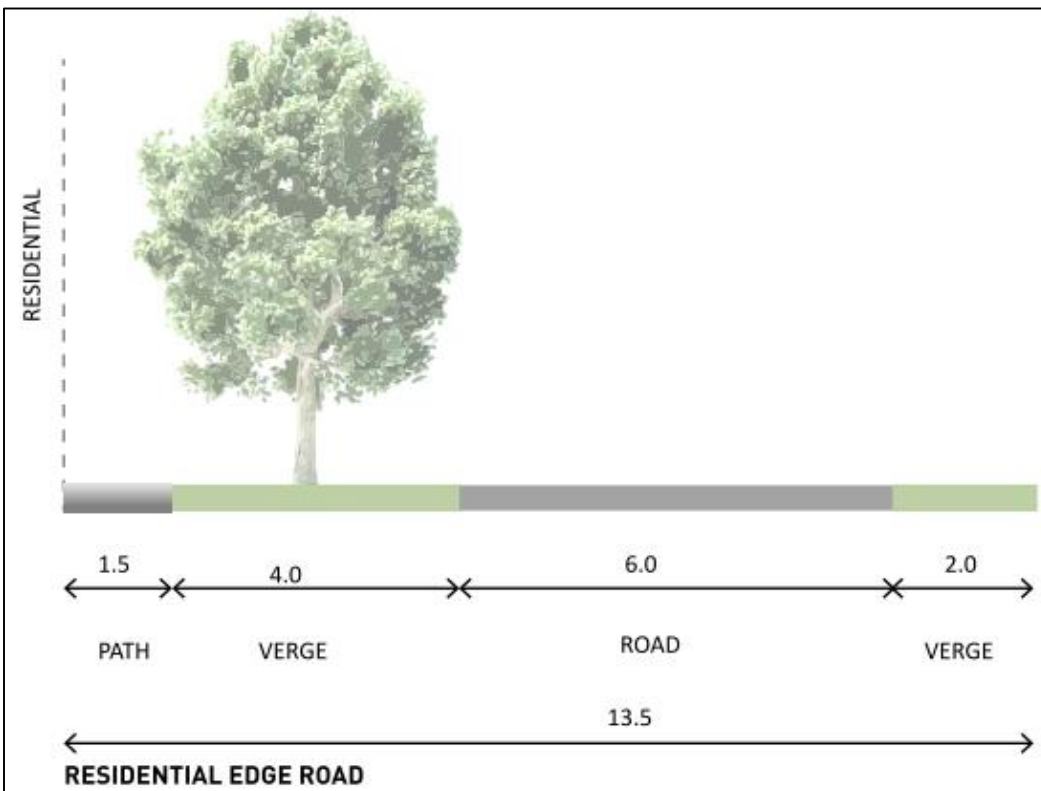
Typical 13.5m - 14m Road Reserve Cross Section
